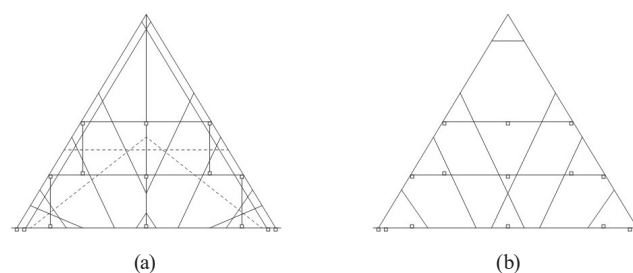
The main truss (a) and the secondary truss (b) of the roof structure of the Reformed Church in Nyírbátor (Source: Fátrai, 2008)
